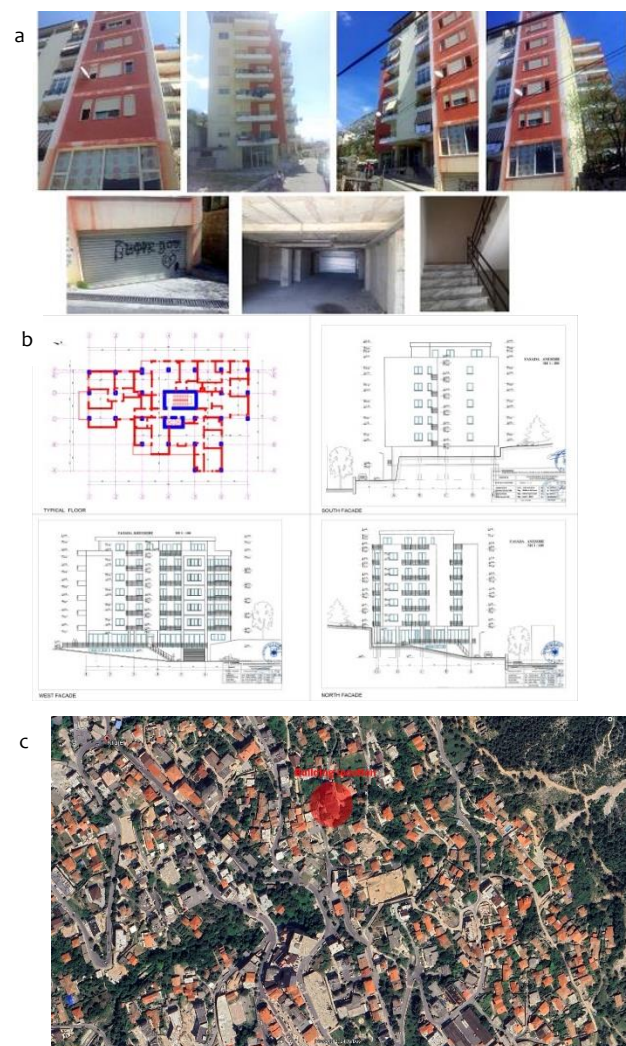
a. Photos of the contemporary building, Kruja, Albania (Source: Authors); b. Typical plan and facades (Source: Authors); c. Location of the building (Source: Google Earth)
